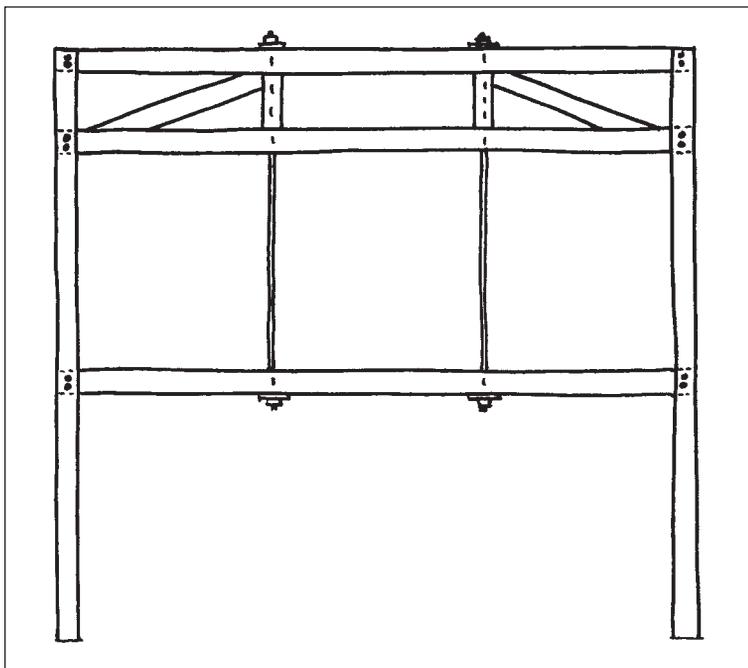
Hanging the second floor from trusses in the attic or roof can leave the first floor free of posts.
